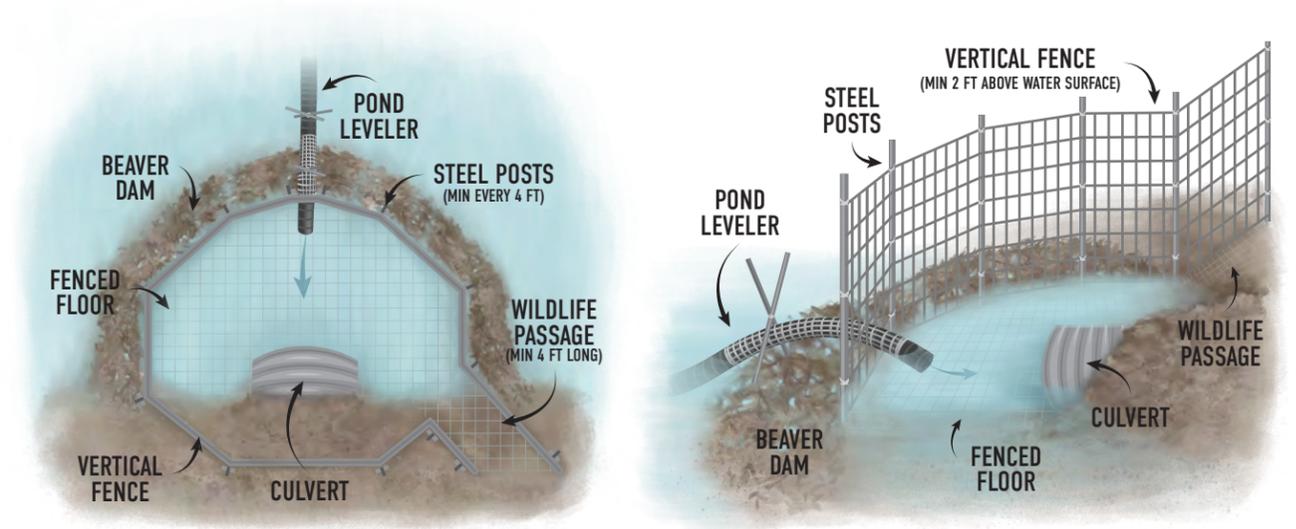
The combination of an anchor fence and pond leveler to create a pipe and fence culvert protection system shown from above (left) and side (right).
